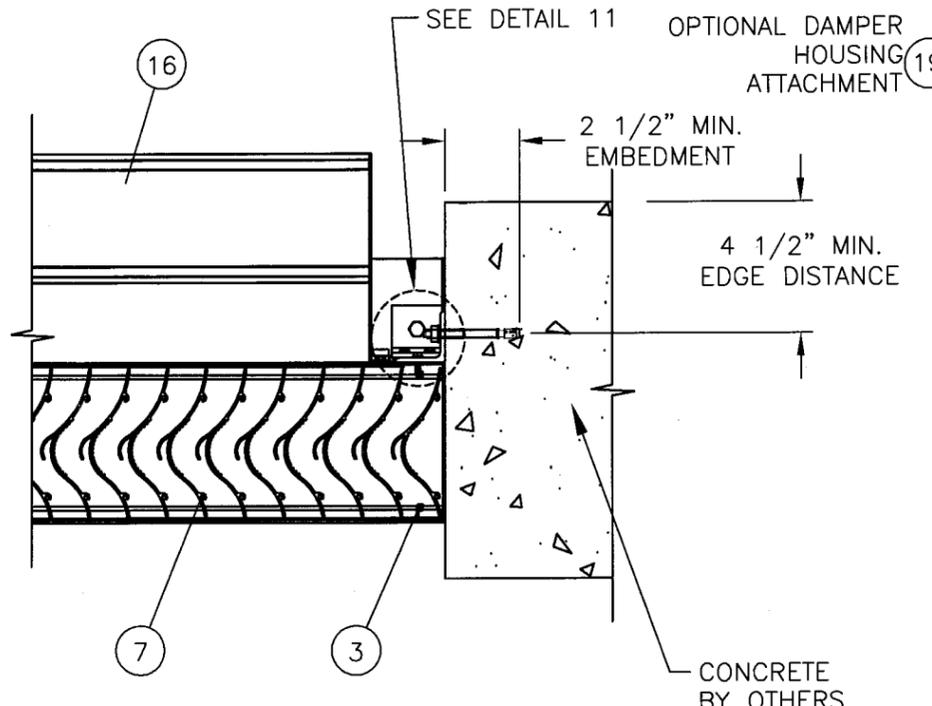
OPTIONAL DAMPER HOUSING ATTACHMENT
